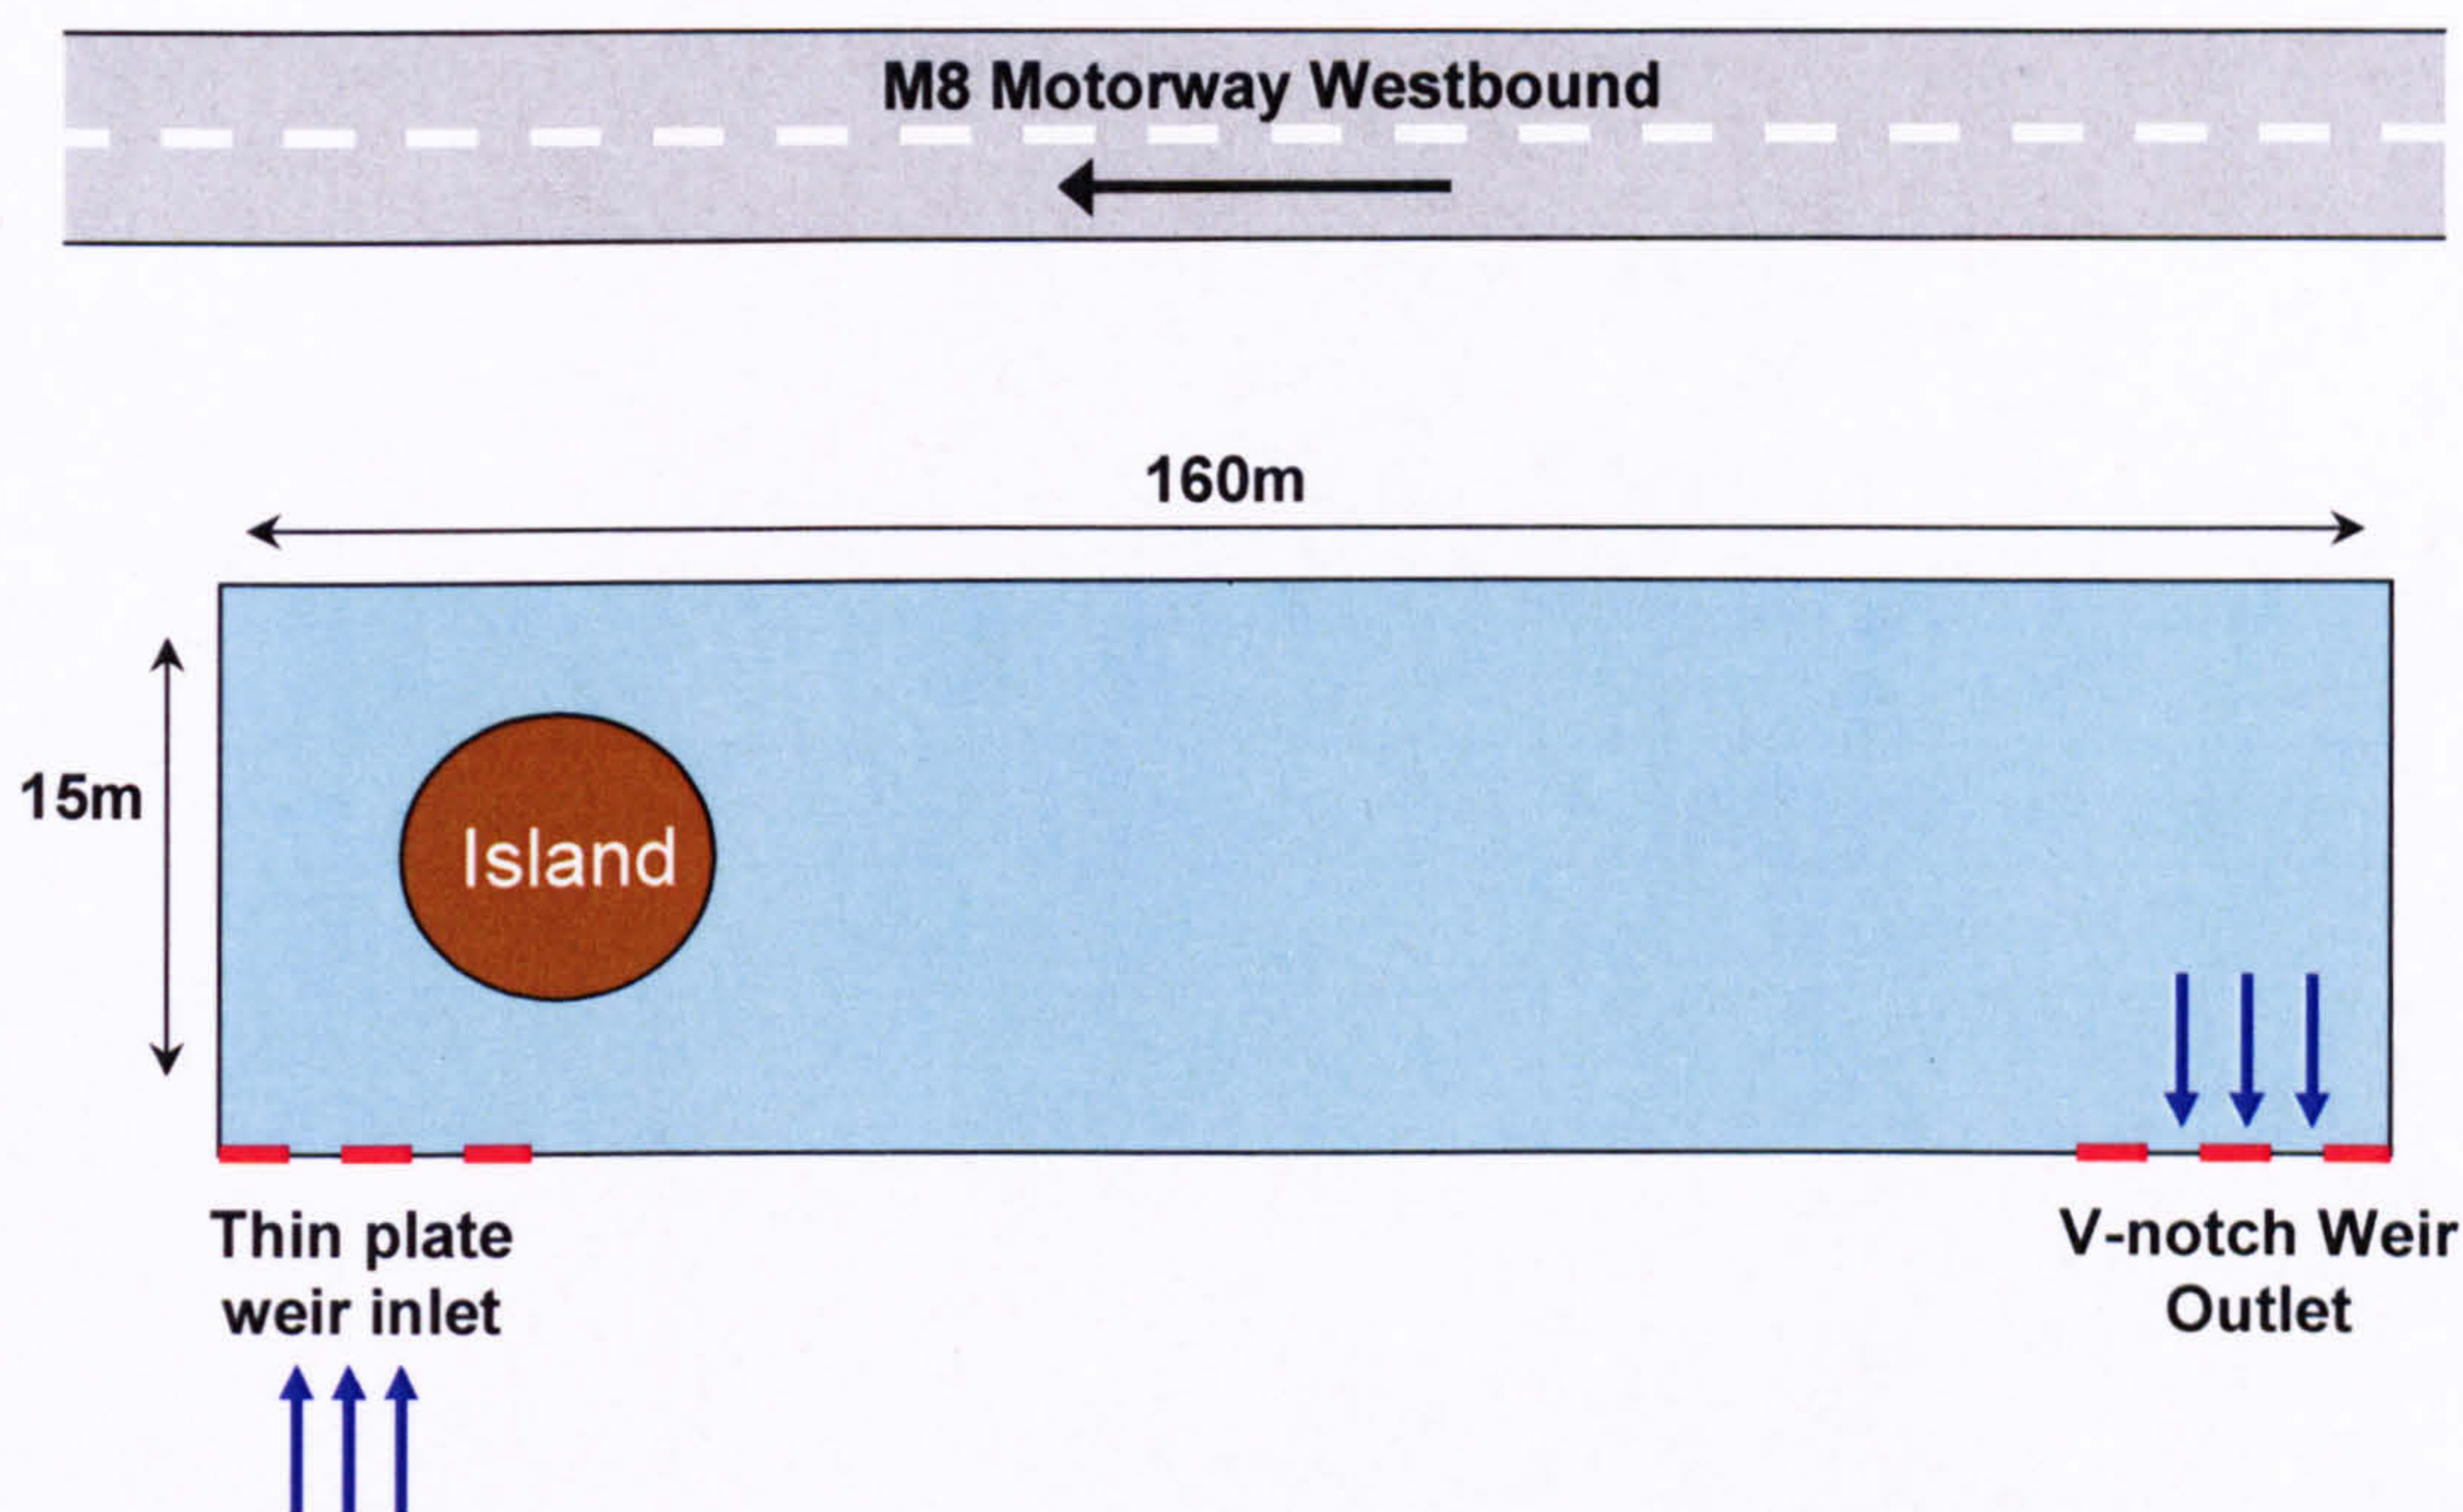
Plan of Claylands pond showing inlet, outlet, island and nearby M8 motorway (adapted from McClellan 1998)
